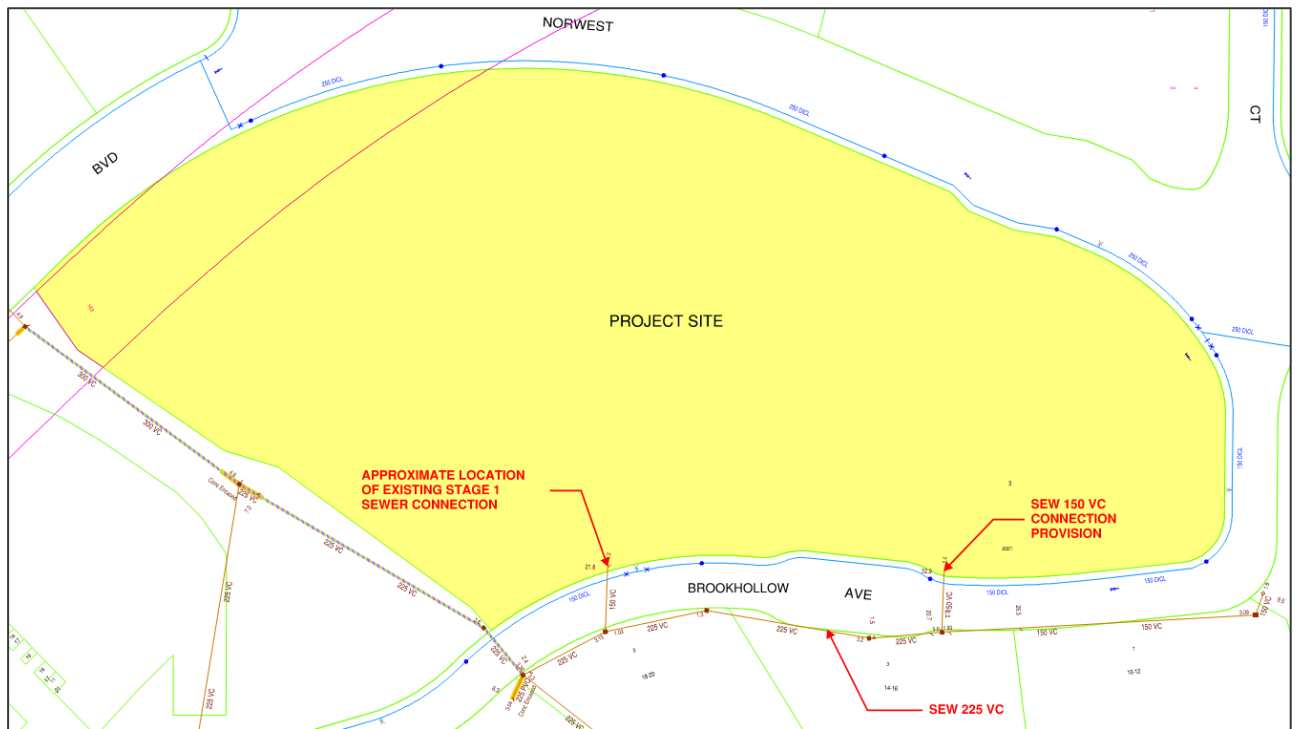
Sewer Assets in proximity to the site (Sydney Water BYDA plan)
